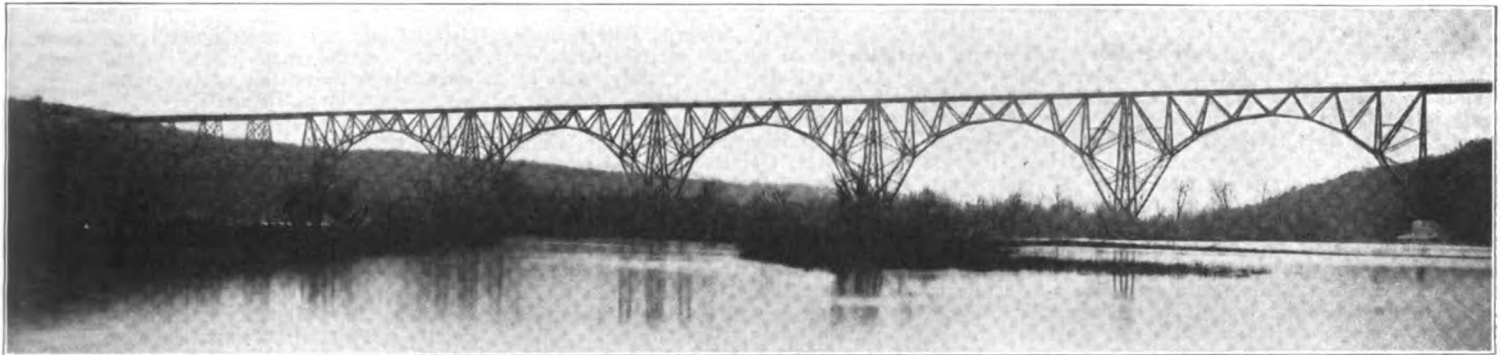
General View of St. Croix River Bridge, Minneapolis, St. Paul & Sault Ste. Marie Railway.
